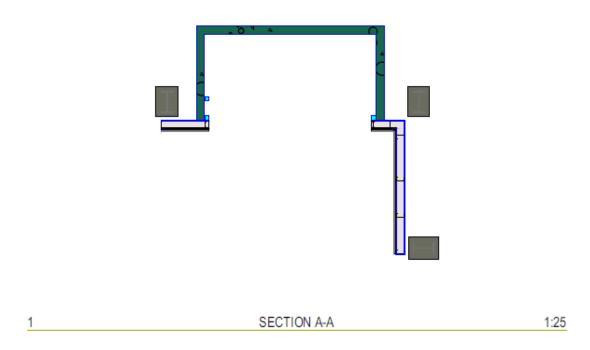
Cross-section (floor level main and wing walls) – provided by client
